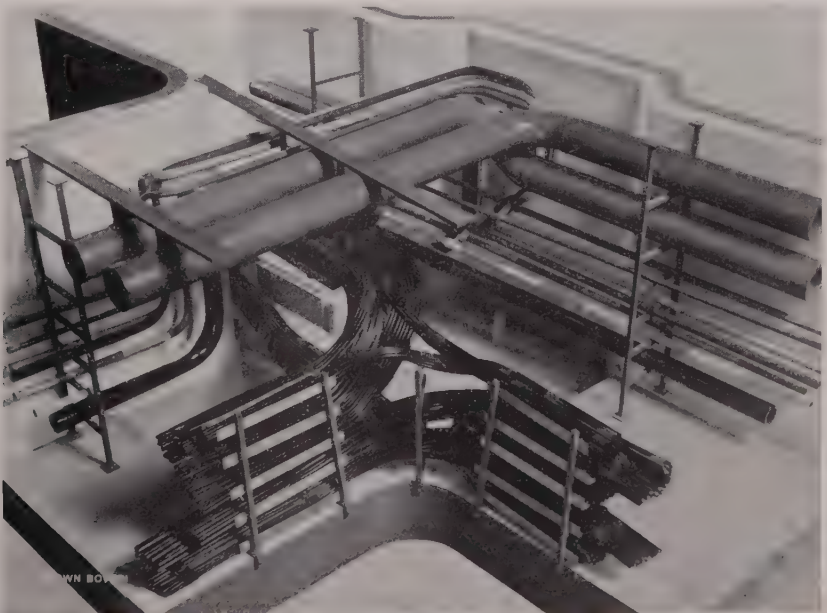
Model showing a junction point to illustrate the layout of cabling and piping (scale 1 : 10)
